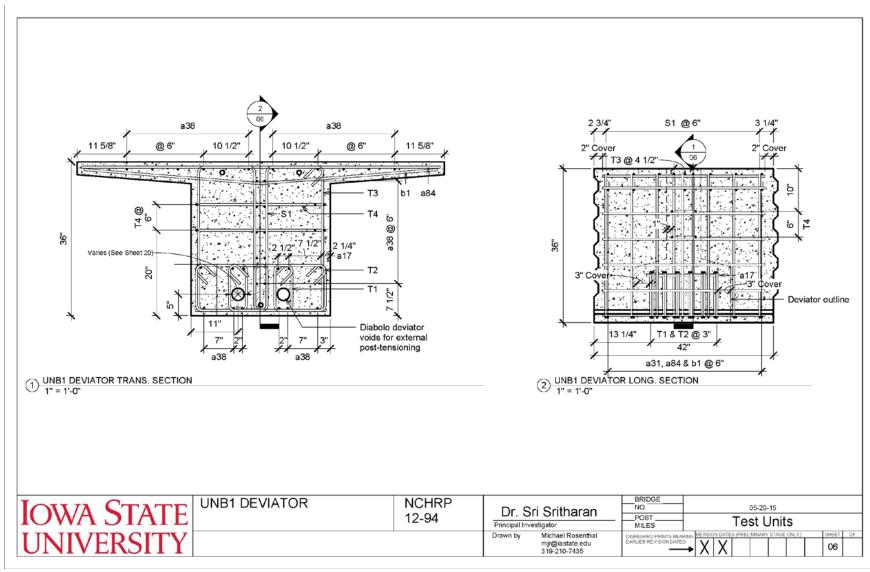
UNB1 Deviator Segment Longitudinal and Transverse Section
